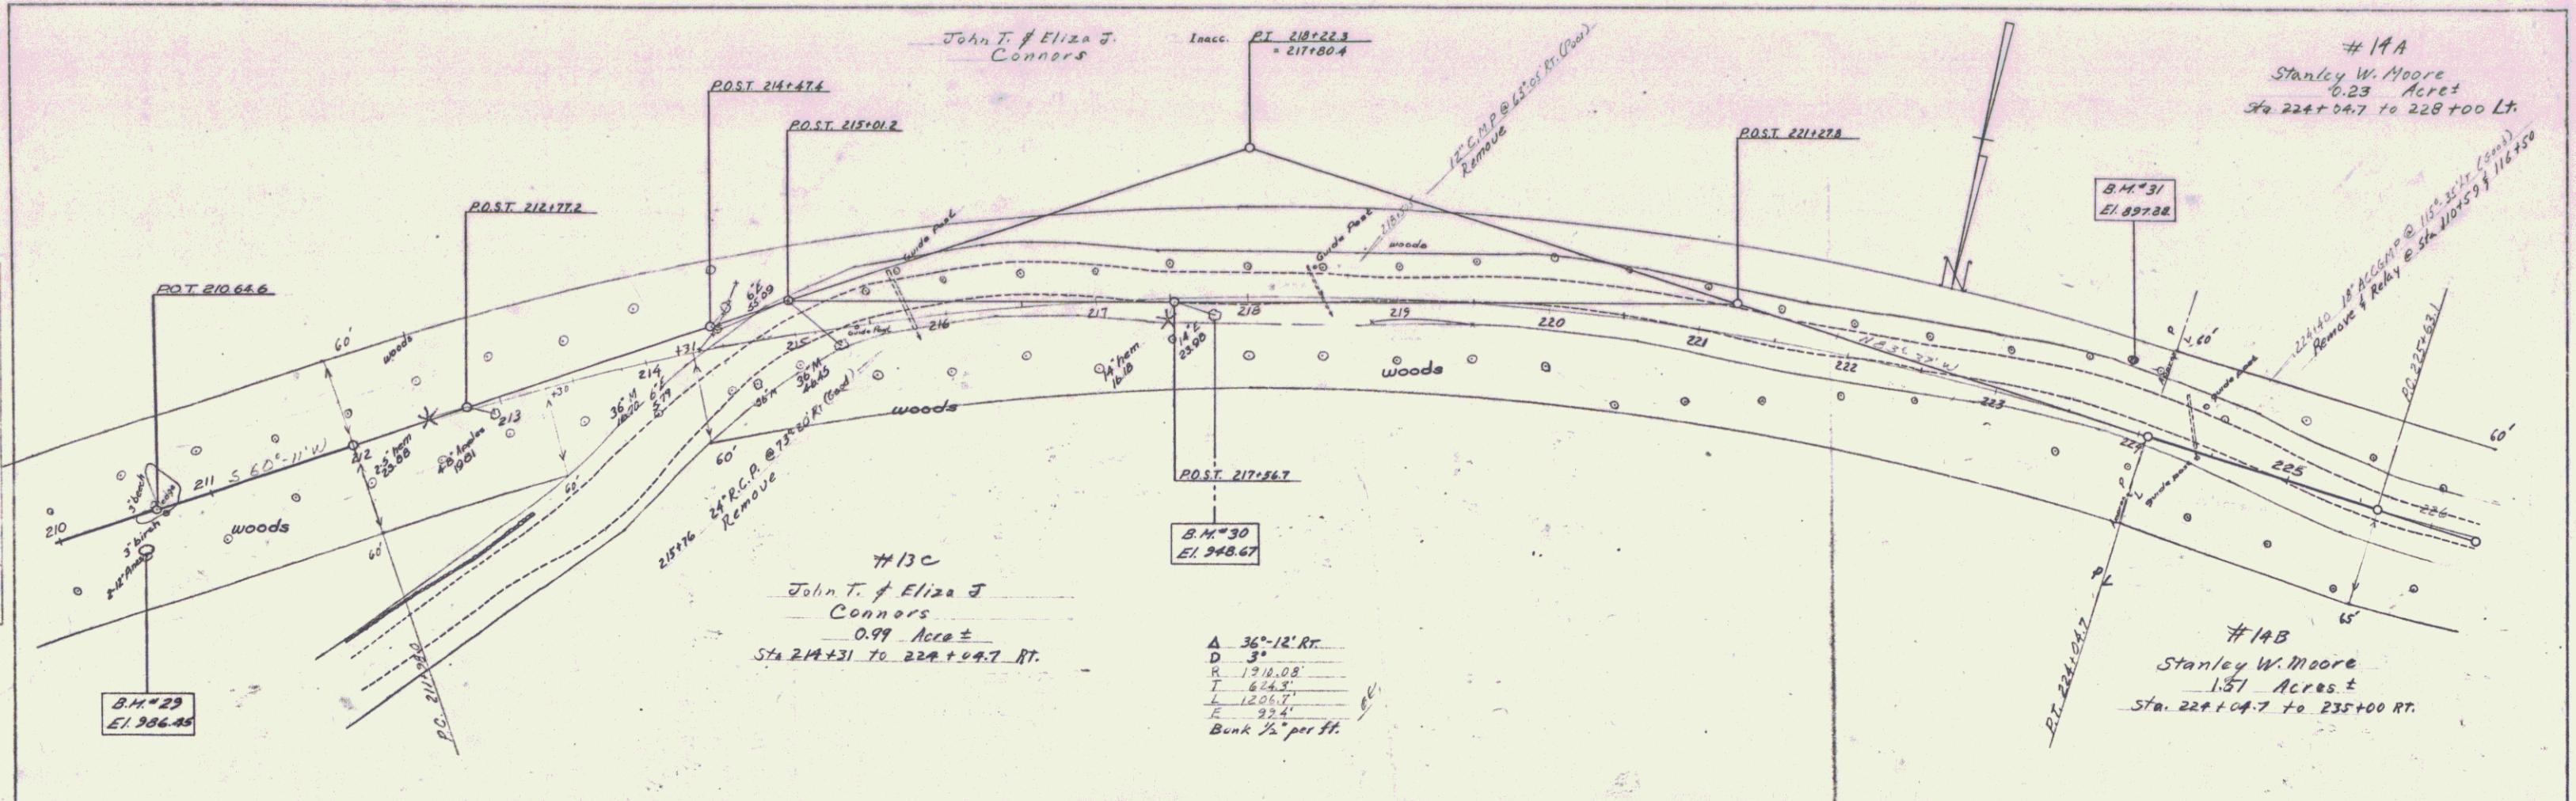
PLAN & PROFILE OF P.A.R. STATION
